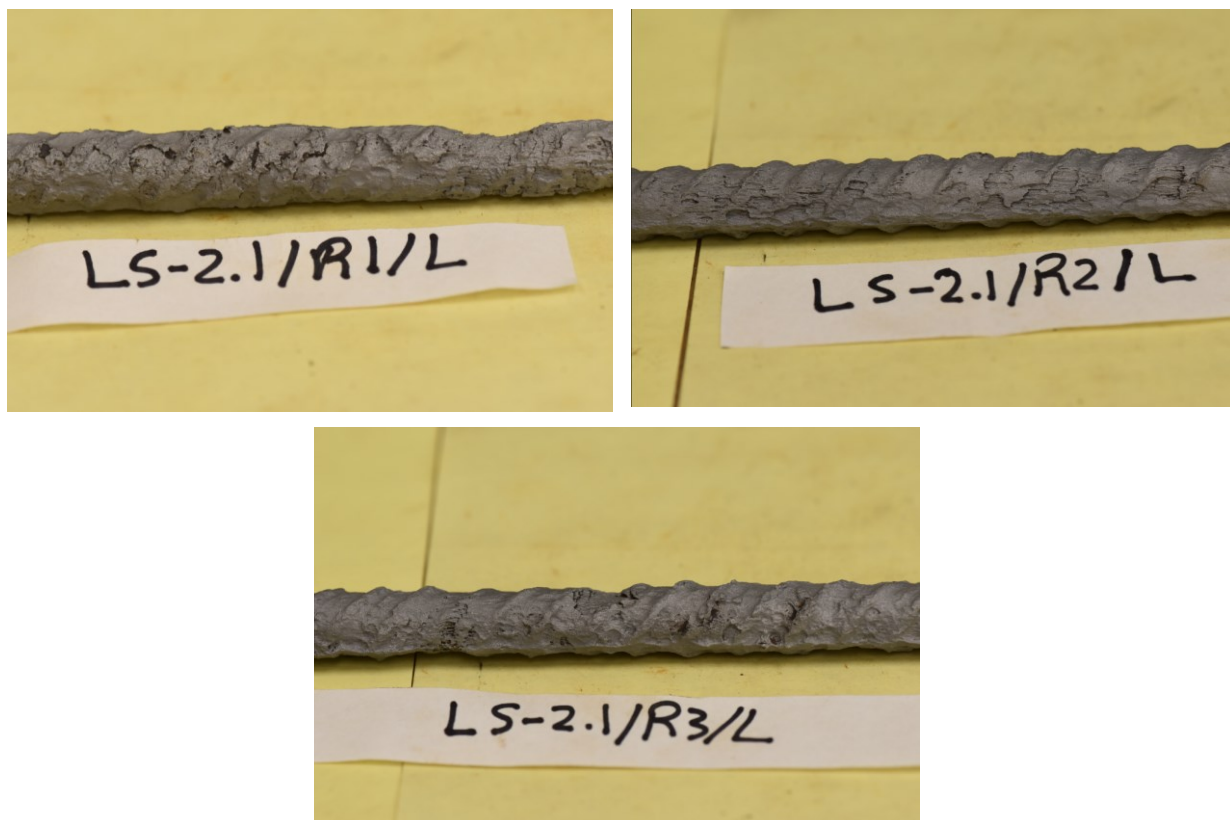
Corrosion patterns on the clean surface of steel reinforcement – beam LS-2.1
